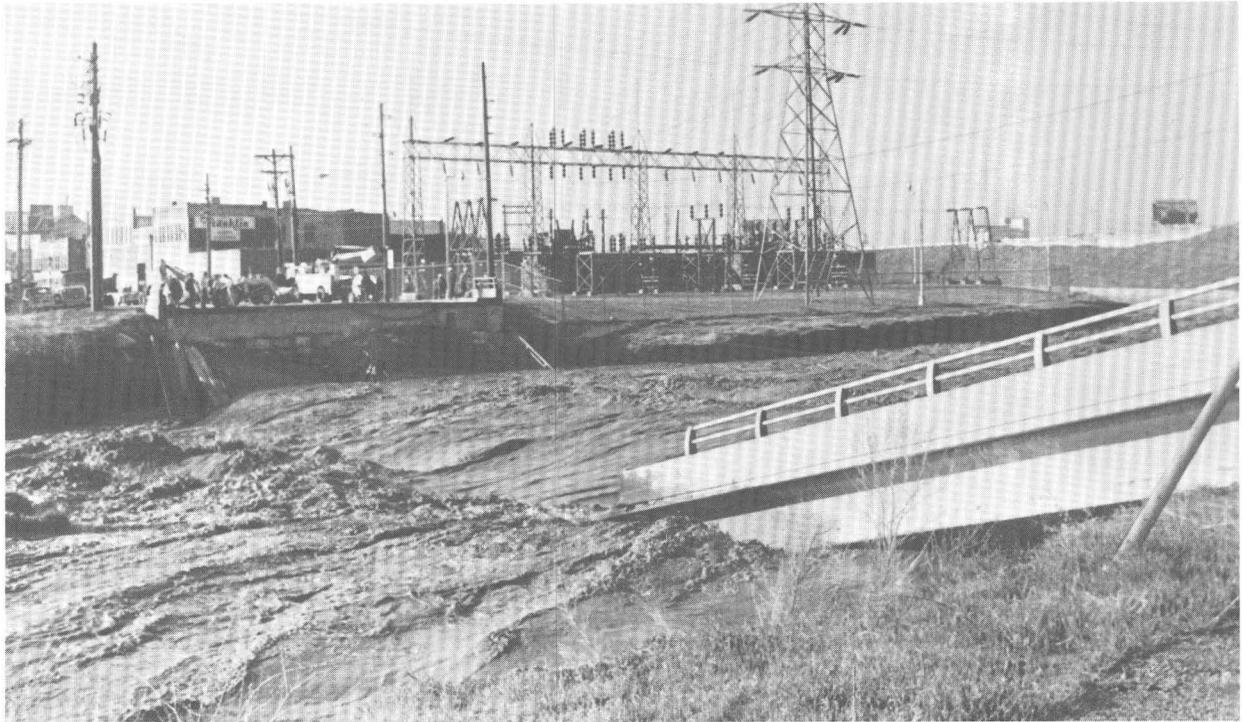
View of 15th Street Bridge in downtown Denver, shortly after its collapse. Center-support pier was undercut by scour. Denver Post photograph by John Prieto, May 6, 1973.
